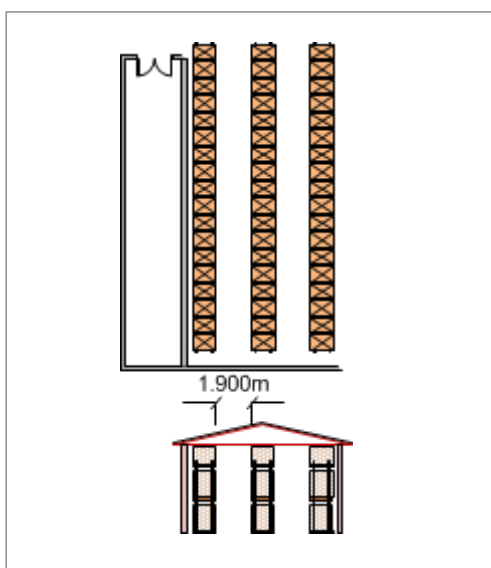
Proposed Sections Layout in Block A of CMS Main Warehouse—Short Term
